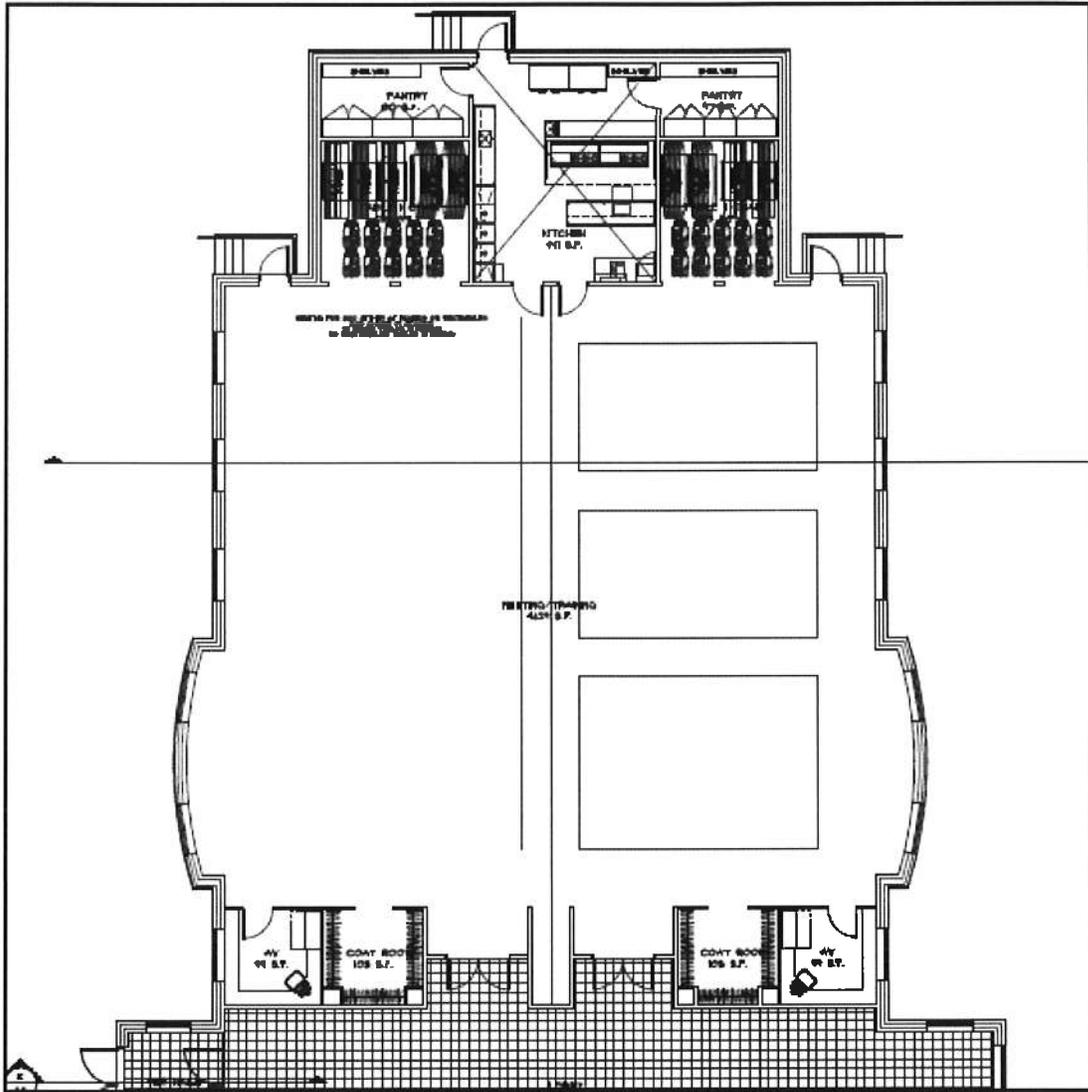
Illustrative First Floor Plan (Western Main Street)
